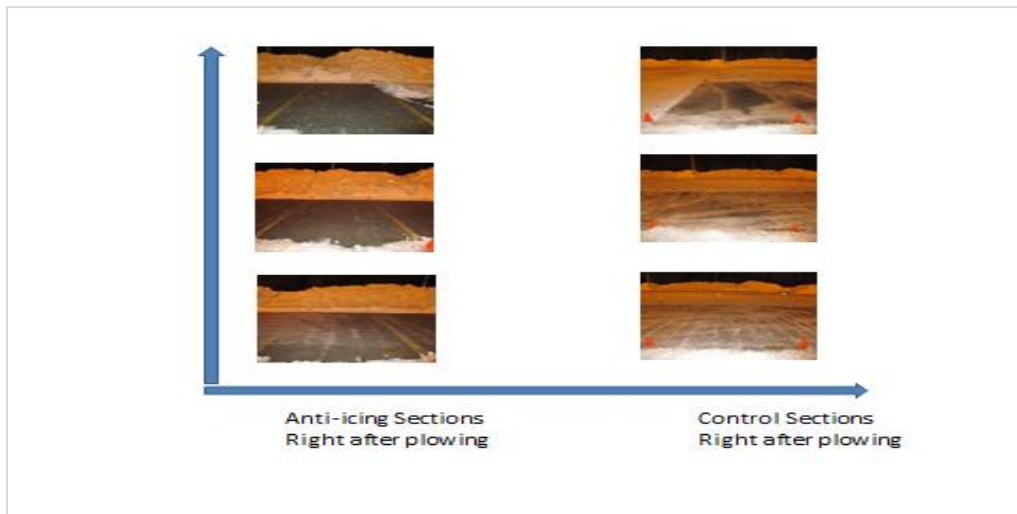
Sample Pavement Surface Condition Image in Anti-icing and Control Sections (15 Feb 2013)
